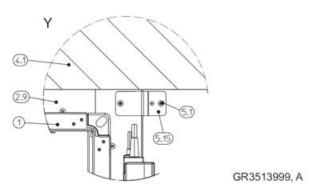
Installation kit – clear space, for installation near the floor or ceiling
